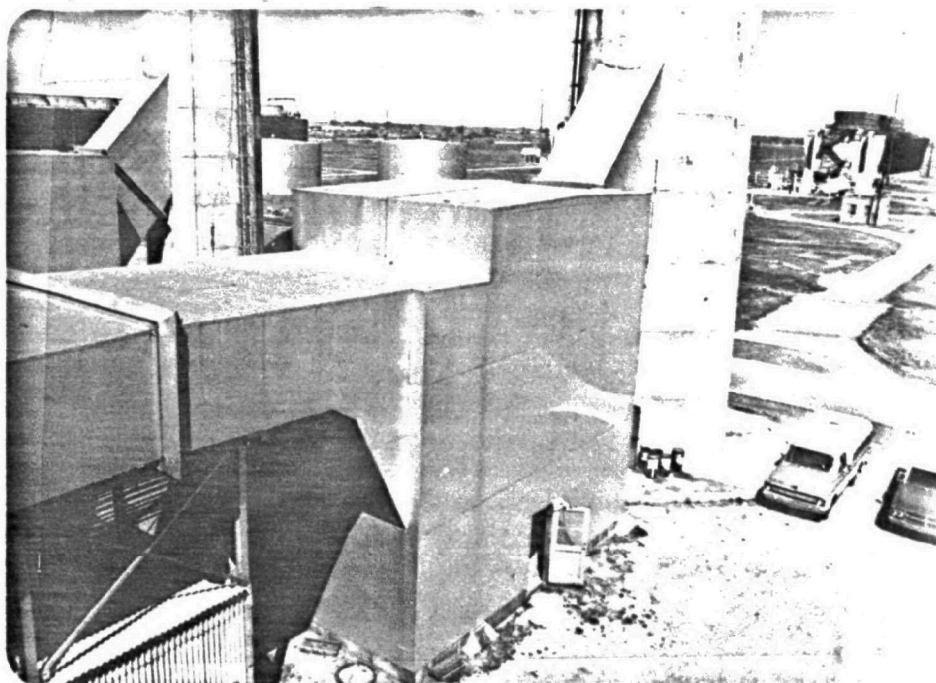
View from the boiler house looking northwest. Stacks 1 and 2 and their lead-in ducts are shown in the foreground of the photo. Cooling towers and oil storage tanks are shown in the background.
